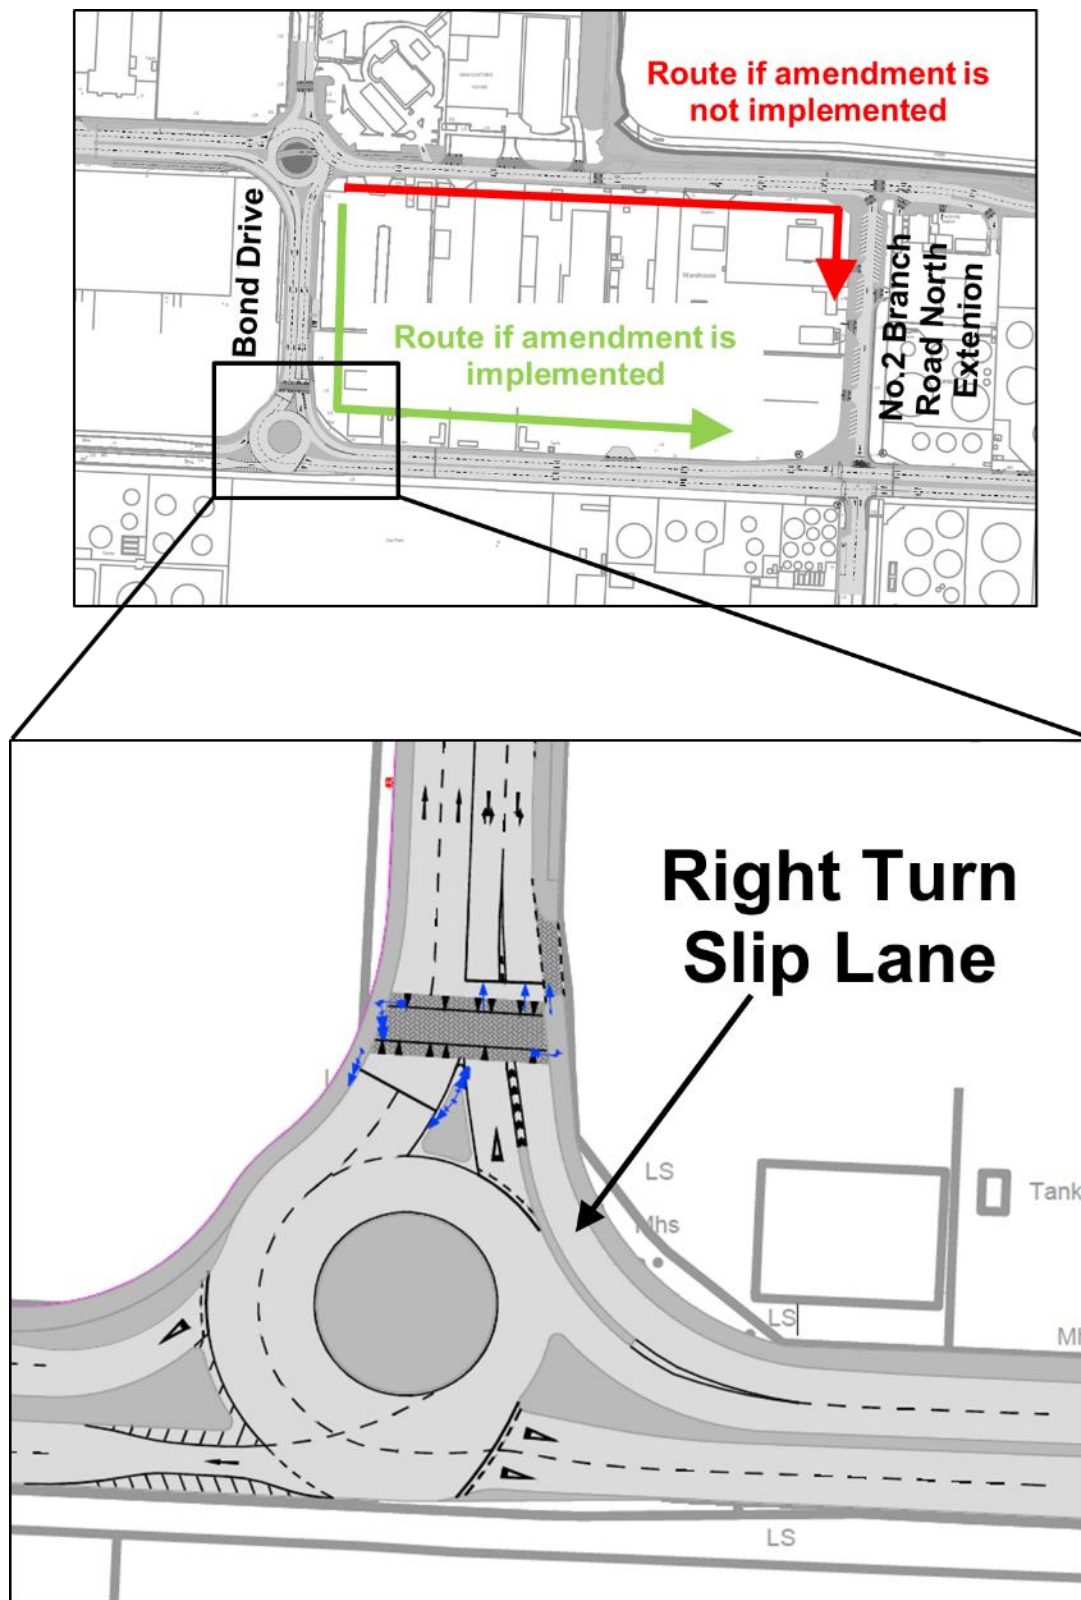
Traffic Routing if Alternative Layout is Implemented
